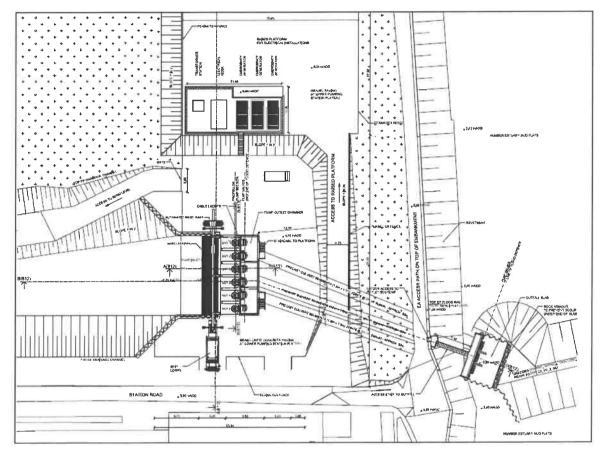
Killingholme Marshes Pumping Station General arrangement plan
